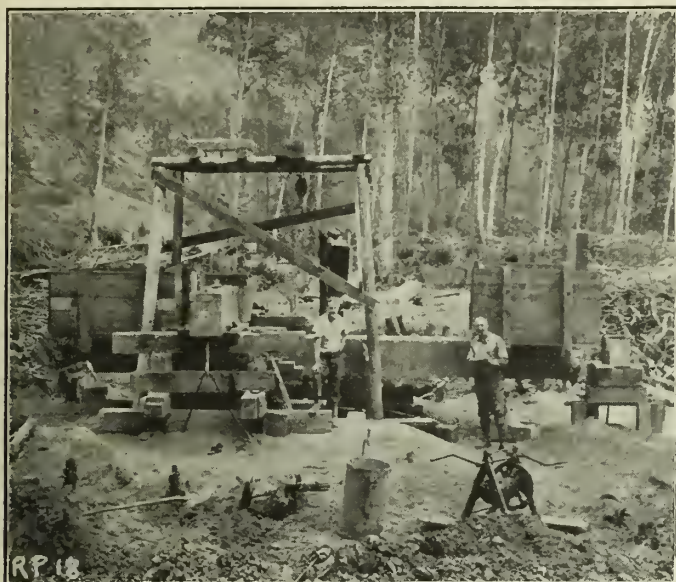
Testing Machine Used in Bearing Tests at Diversion Dam.
